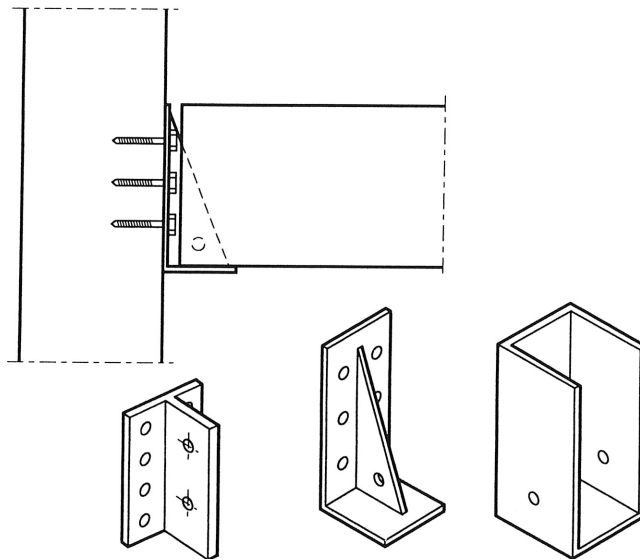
Beam shoe or bracket. The column will be loaded eccentrically.
